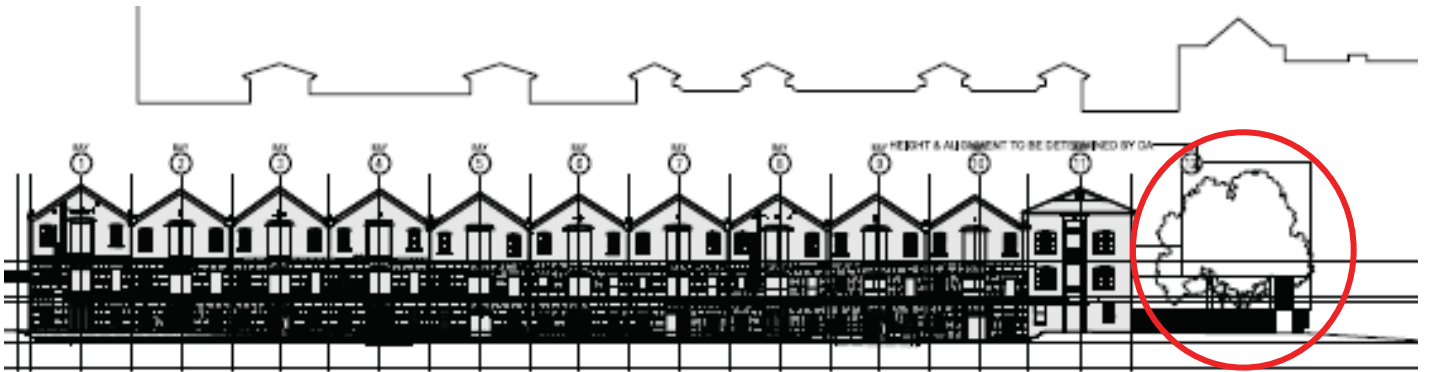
Preliminary DA drawing showing the existing buildings and the subject tree adjacent to bay eleven.
